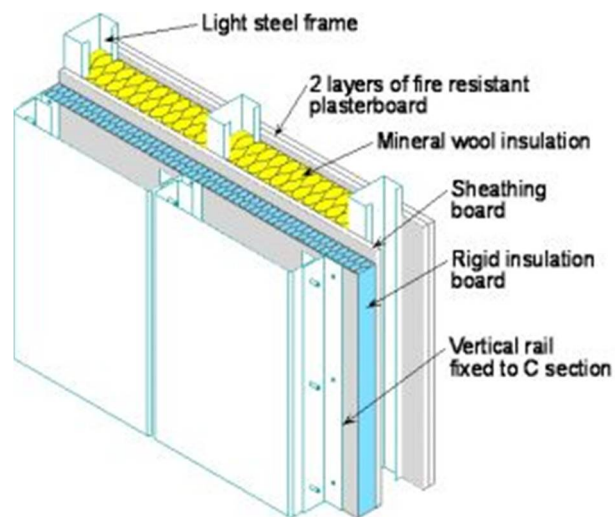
Light steel infill walls with metal rain-screen (www.steelconstruction.info)
